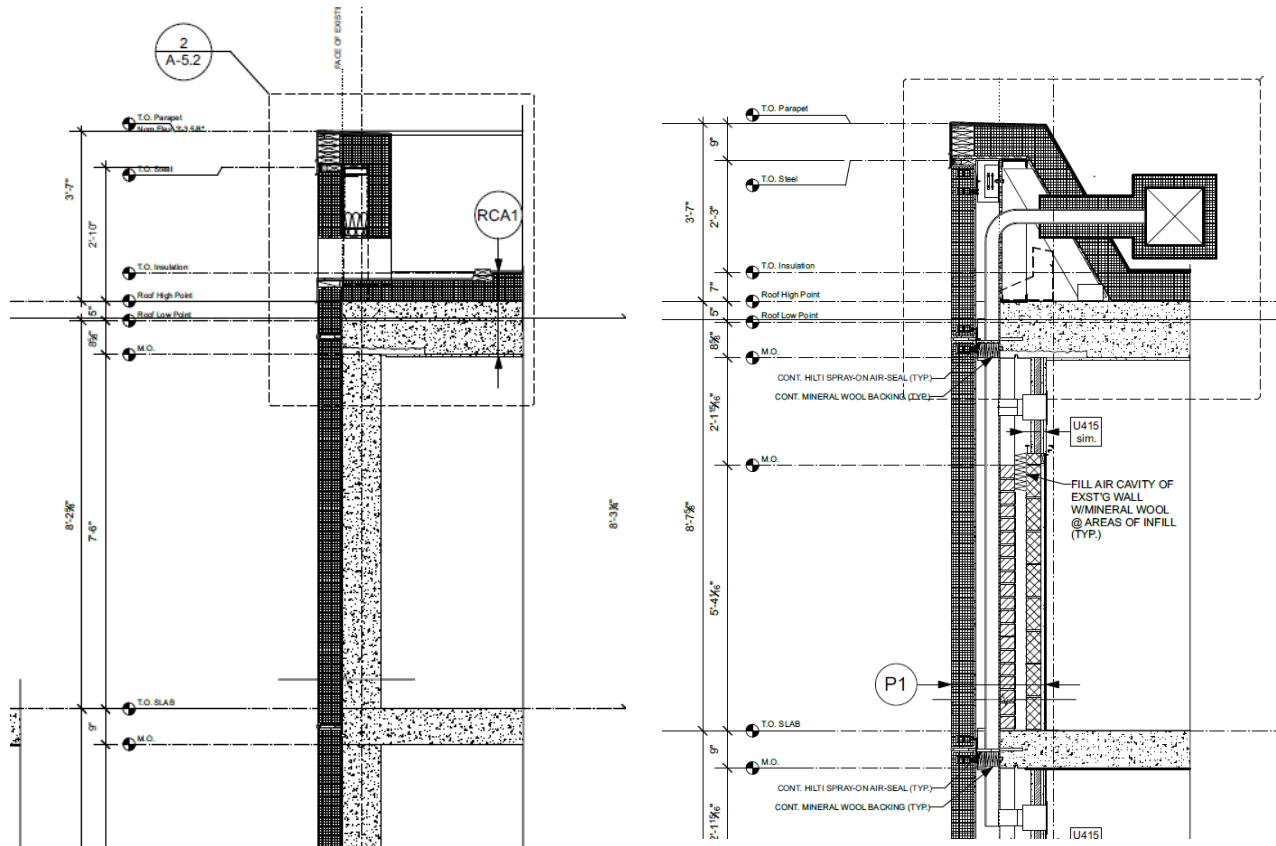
Section detail of “Return Wall” (left) and front and rear elevation with Revitalite (right)
